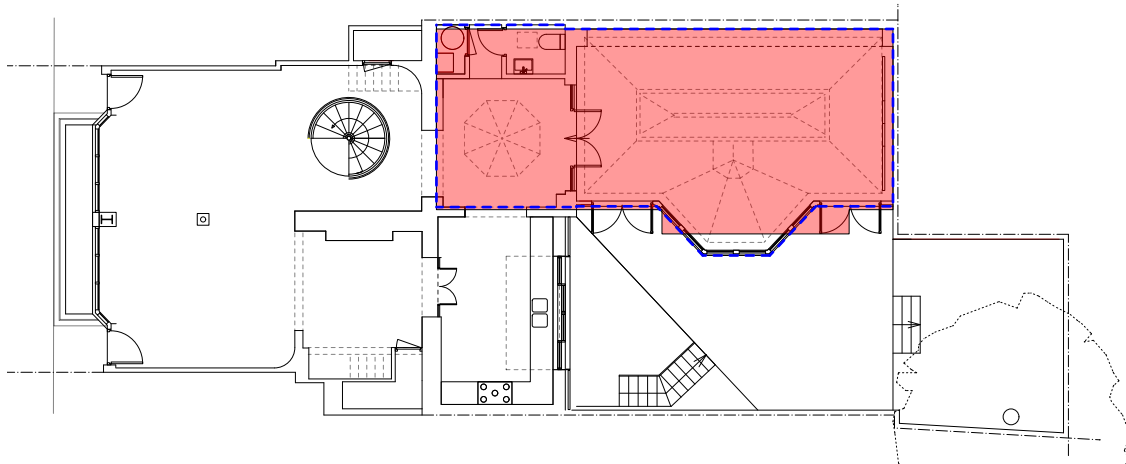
Image Above: The 1980's period single storey extension and conservatory (outline with dotted blue line (61 Sq m) shall be demolished. A new extension with reduced glazing and increased thermal insulation shall be constructed in it's place, on an equivalent footprint (61 Sq m). There will be no net loss of garden amenity space.
